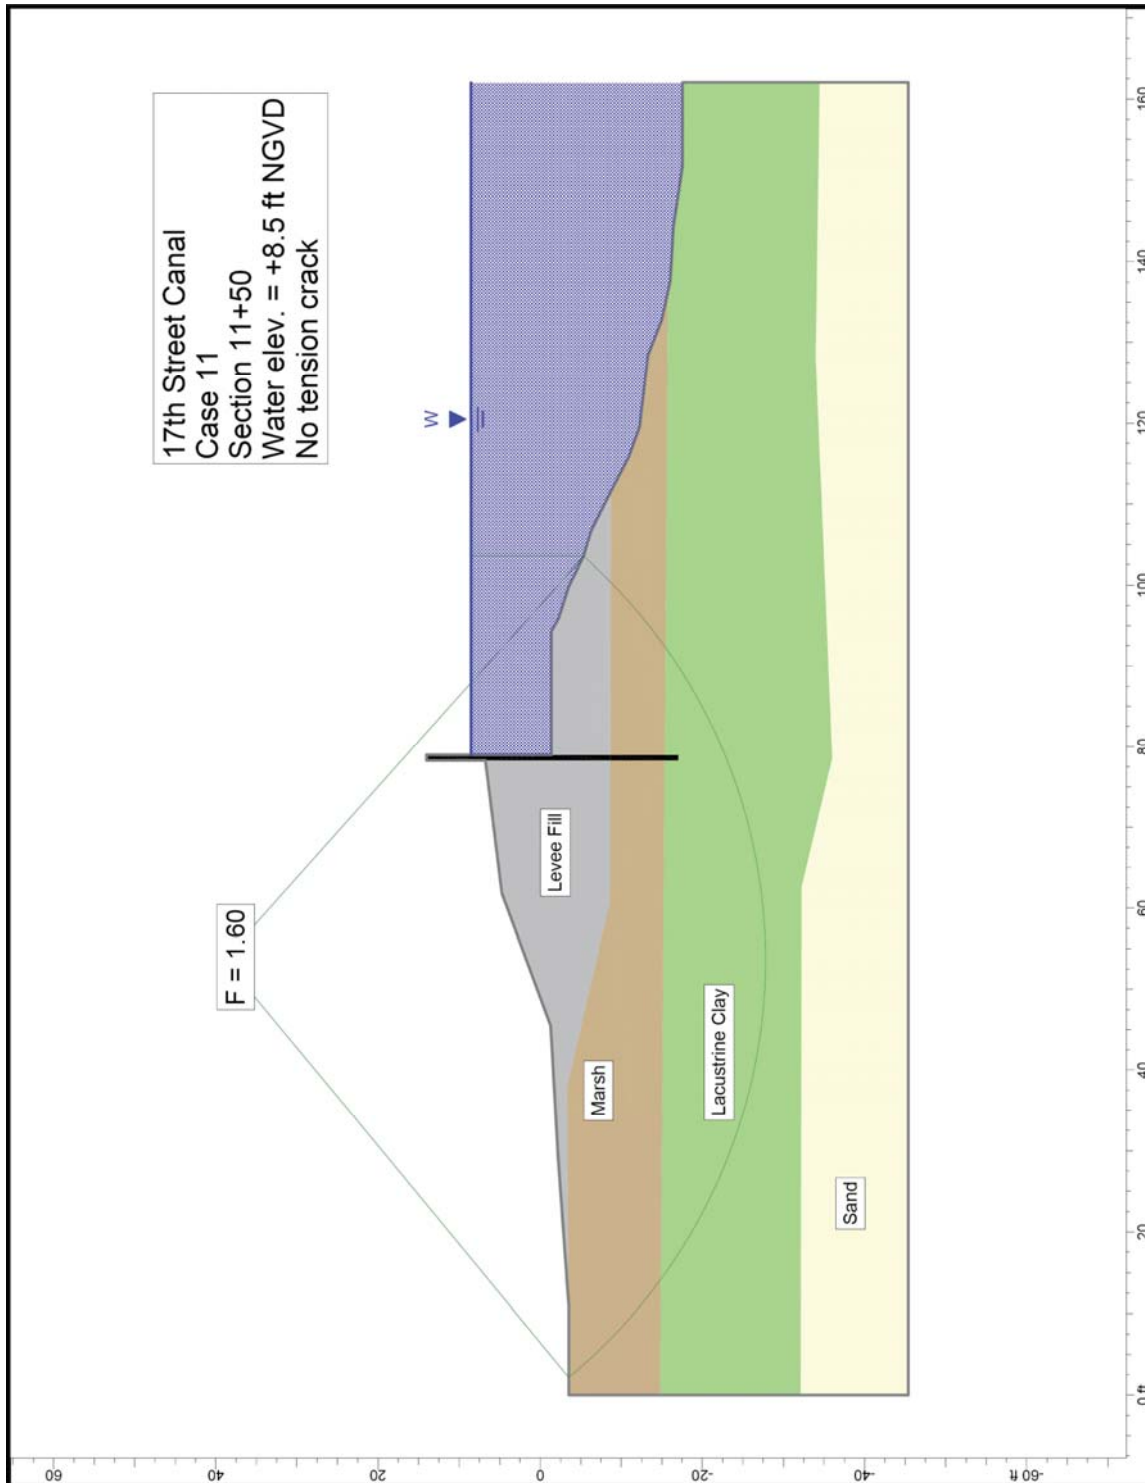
Critical circle for 17th Street Canal Station 11+50 – water elevation 8.5 ft, no tension crack.
